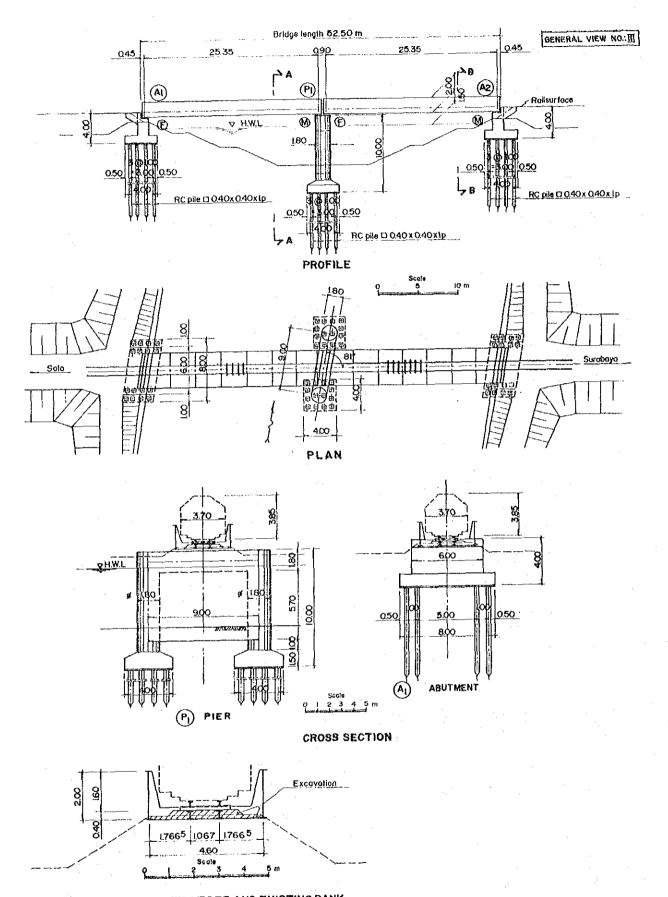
PROPOSED HIGHWAY BRIDGE AT DIVERSION CHANNEL
